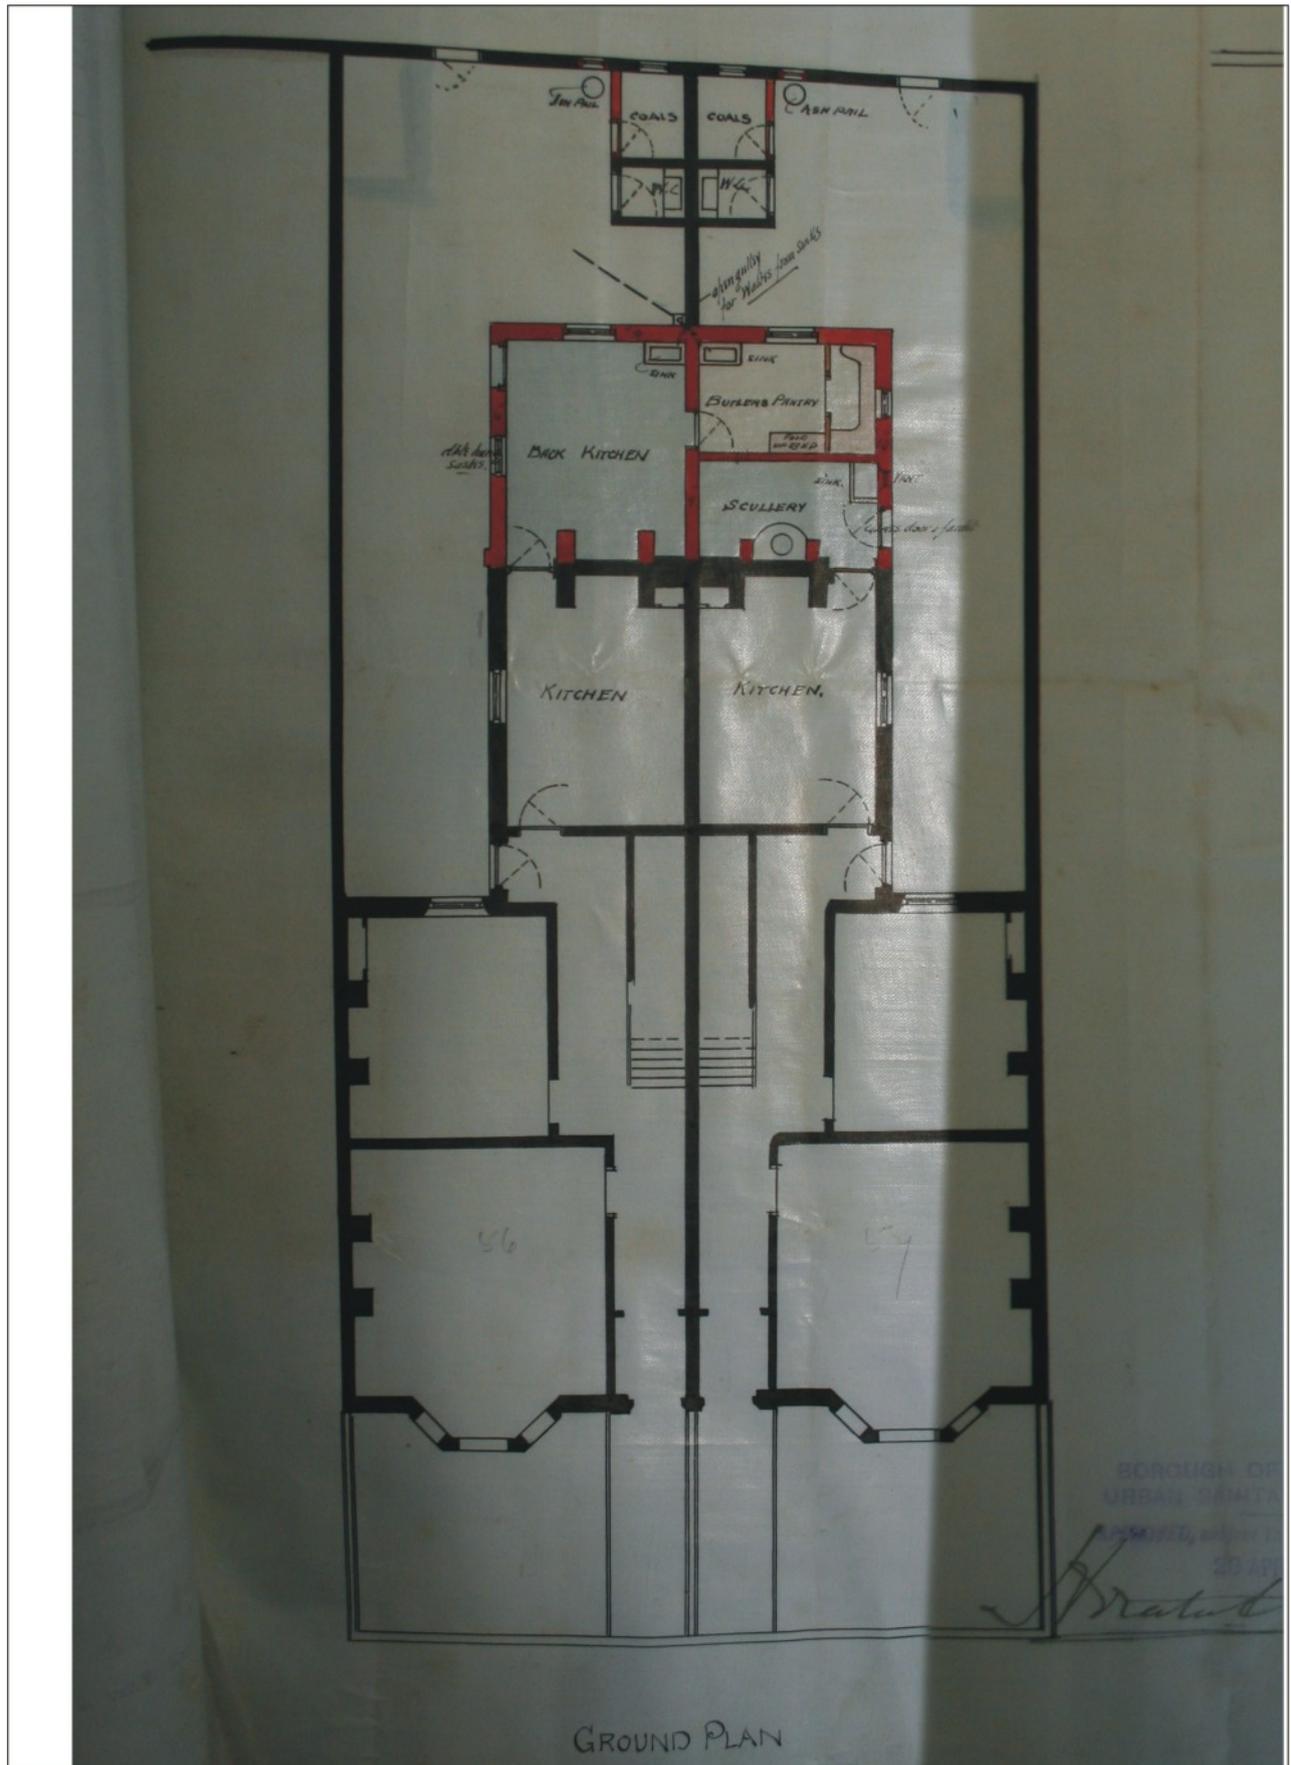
Leeson's 1891 alterations plan of 56-57 Beverley Terrace, ground floor.
